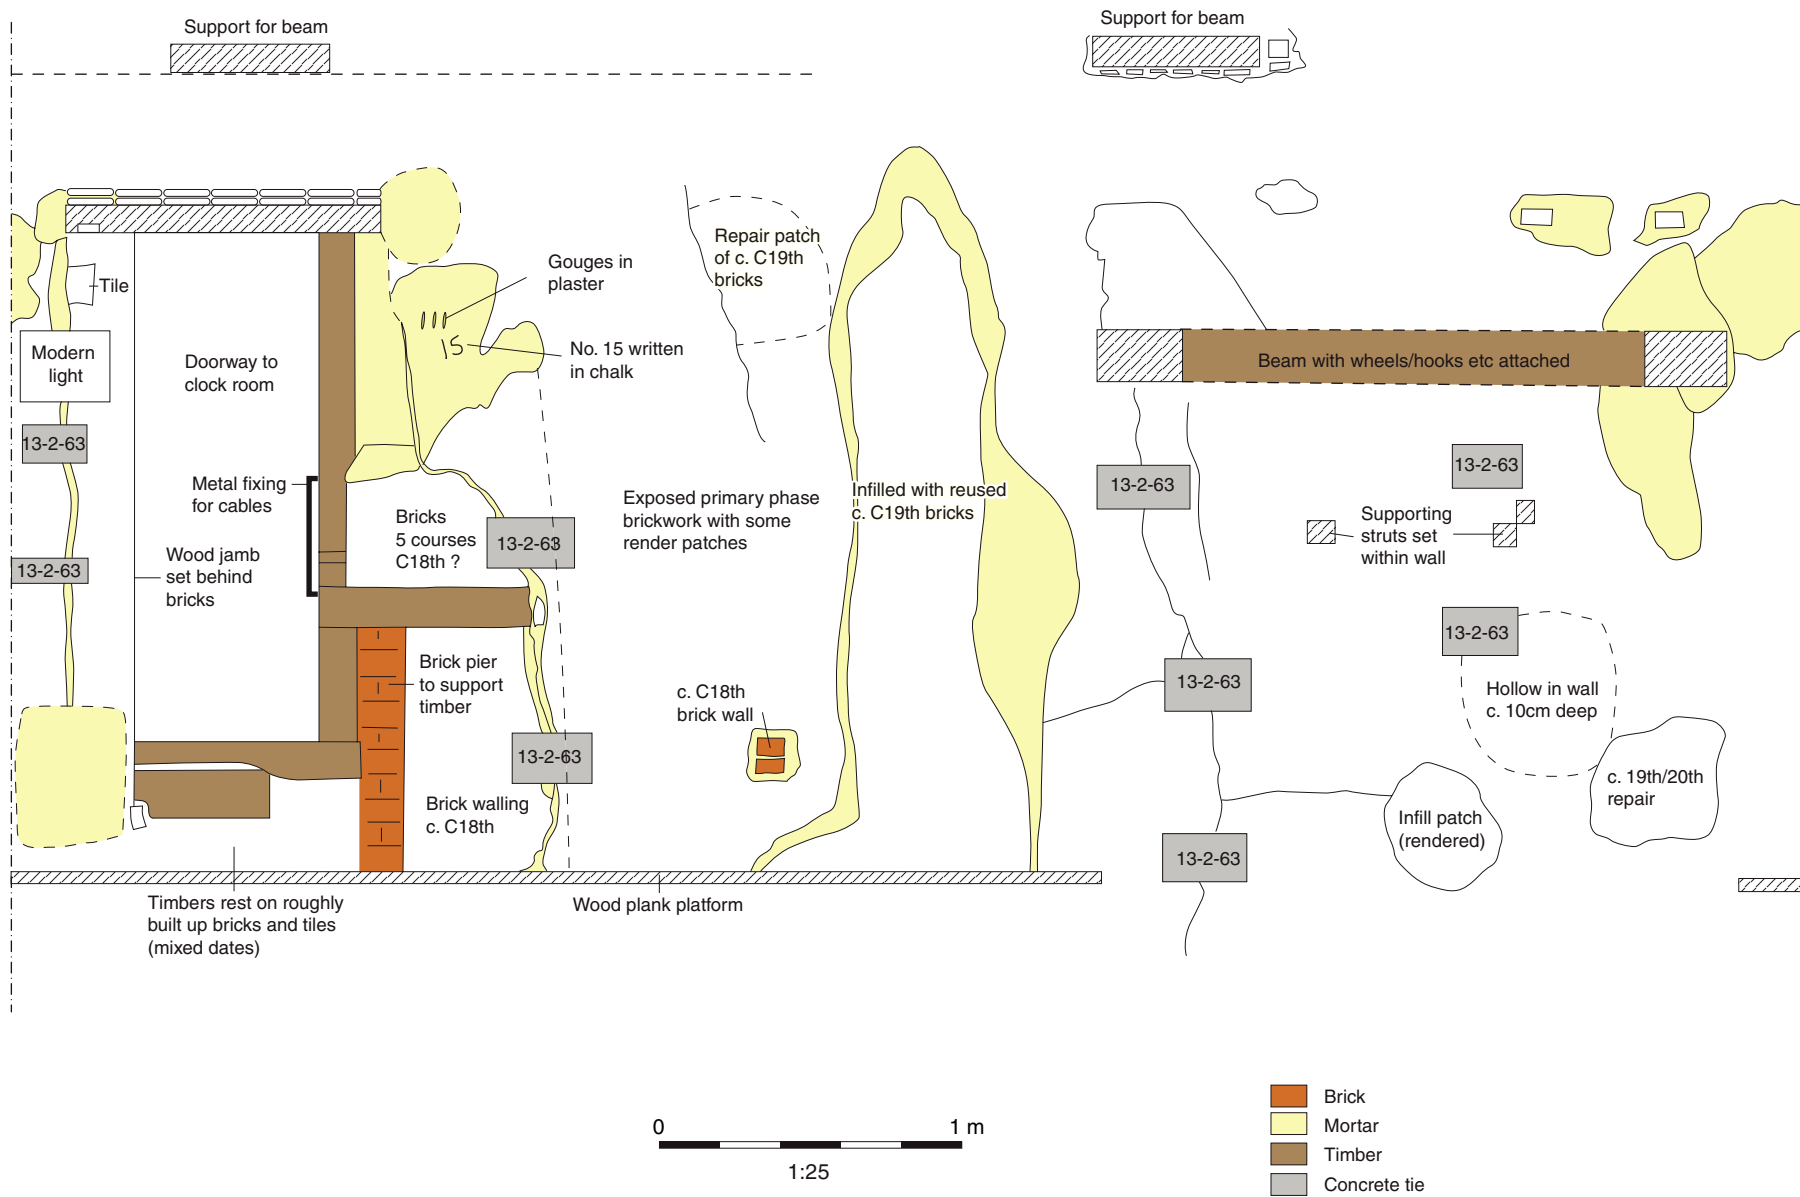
North-west turret - interior elevation of turret adjacent to clock room
